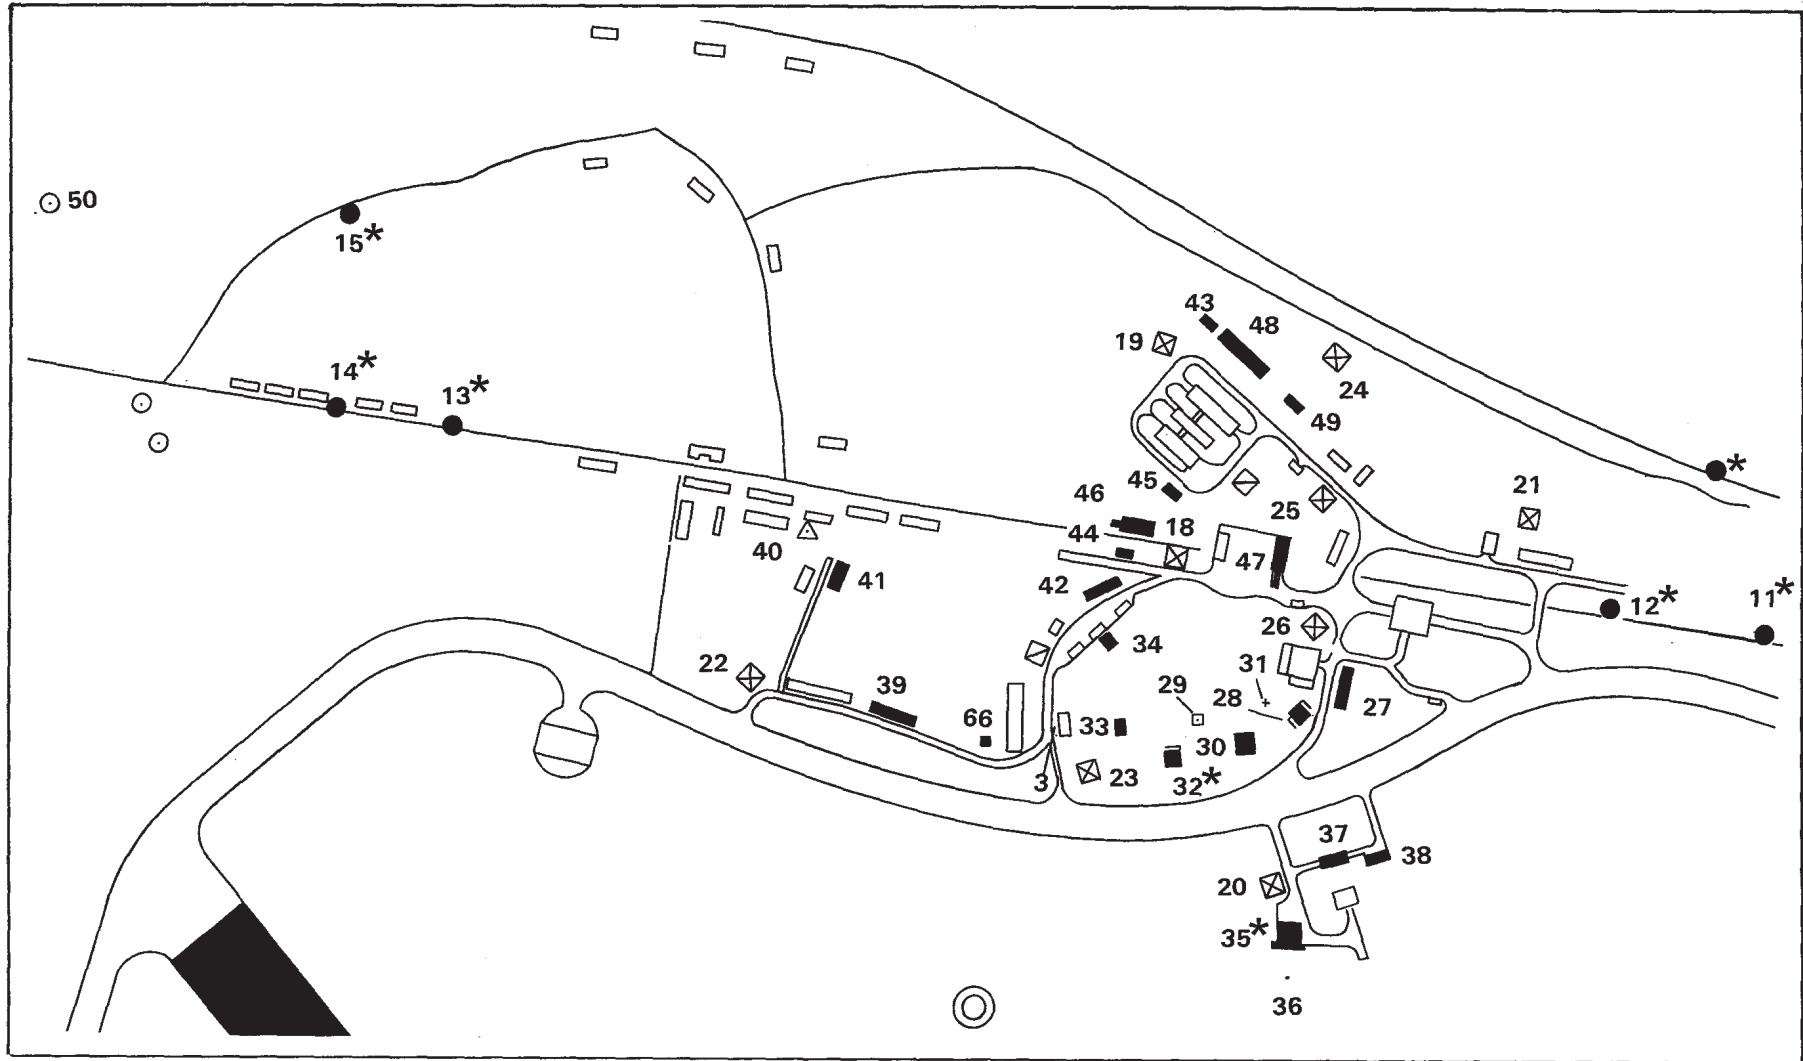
Plan showing surviving buildings (February 1997) on the Technical Site.* indicates Scheduled structure.
